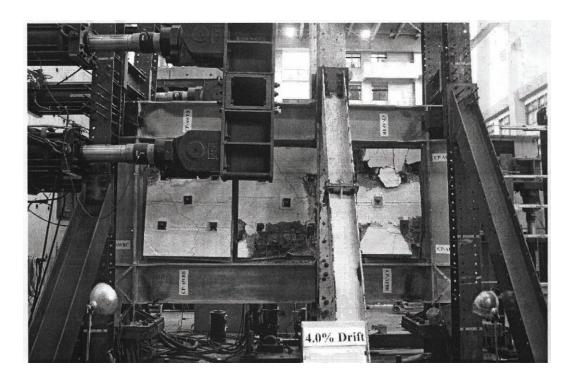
Specimen CP Test at 4% Drift (Lin and Tsai 2004)
